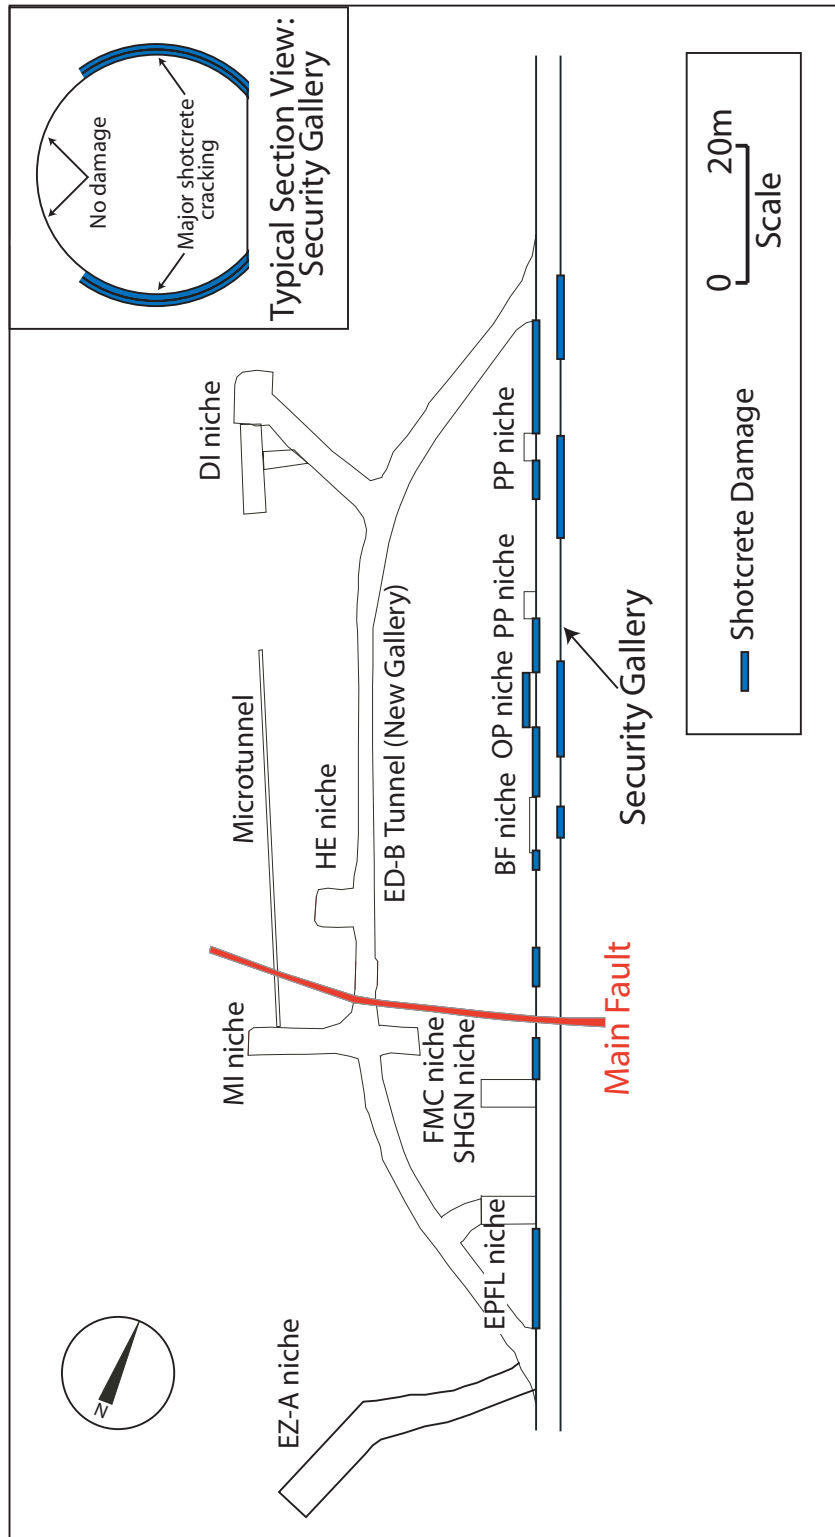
Plan view of Mont Terri rock laboratory showing the distribution of cracking along Security Gallery and typical section.
